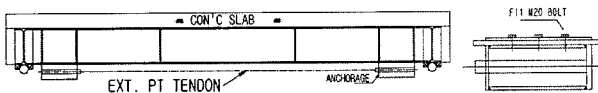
Plan view of Straight Tendon (Detail Anchorage)
